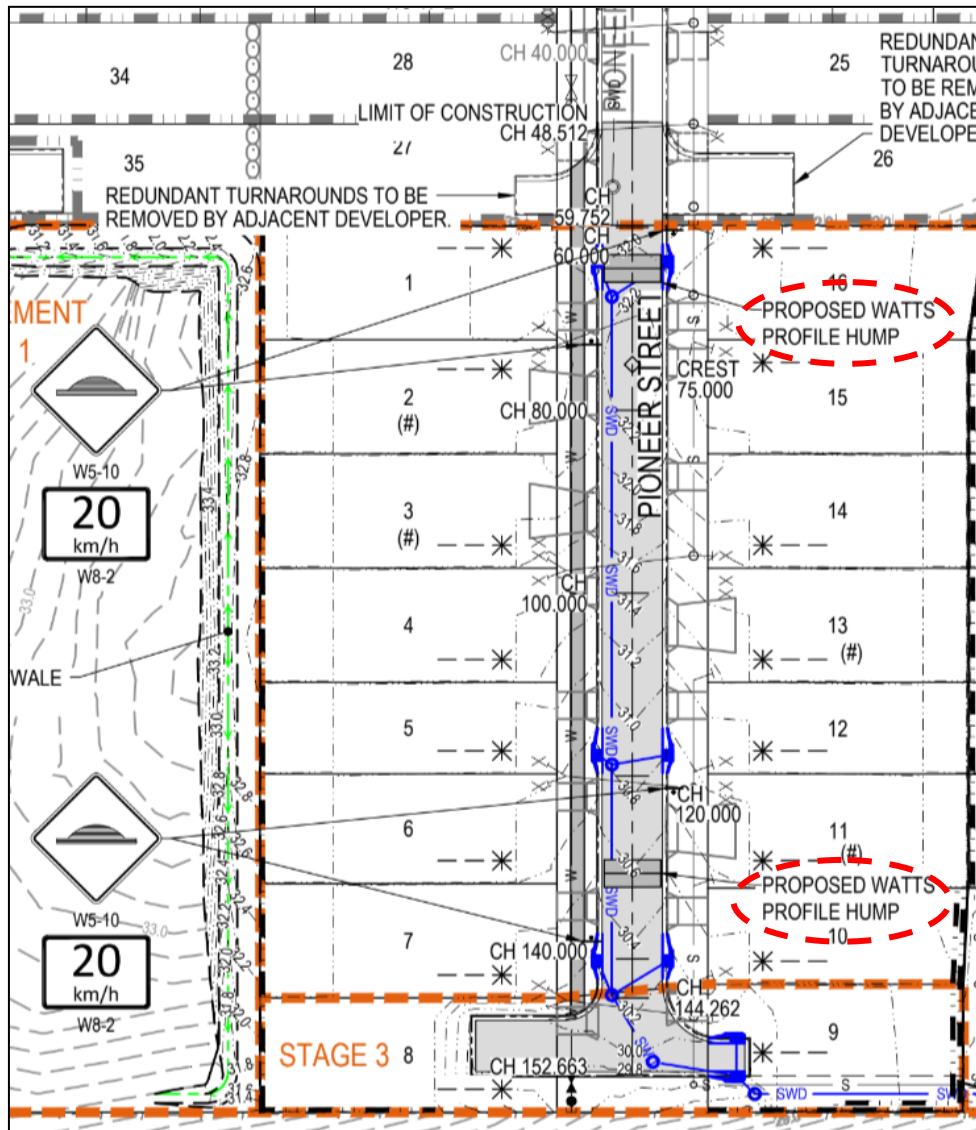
Civil drawings (Source: Burchills Engineering Group)
